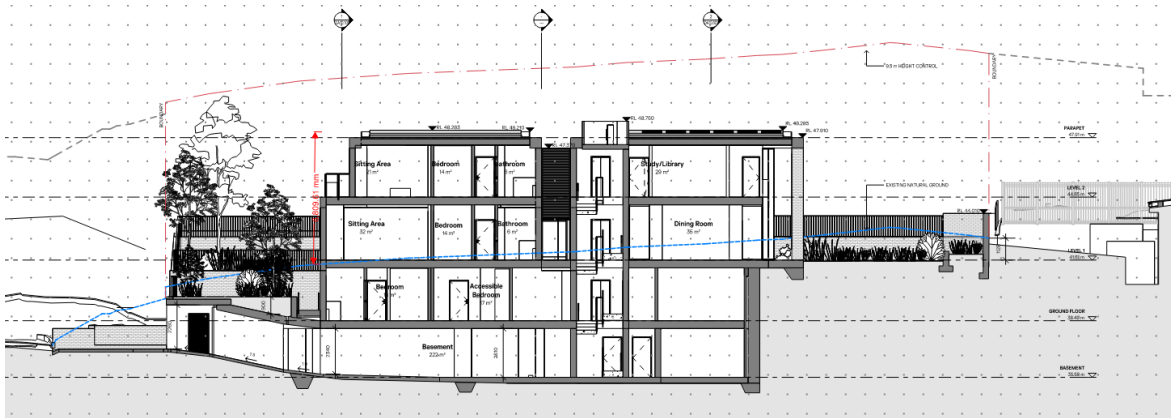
Long Section illustrating extent of level change and excavation with ground level recessed and concealed from the street frontage.
